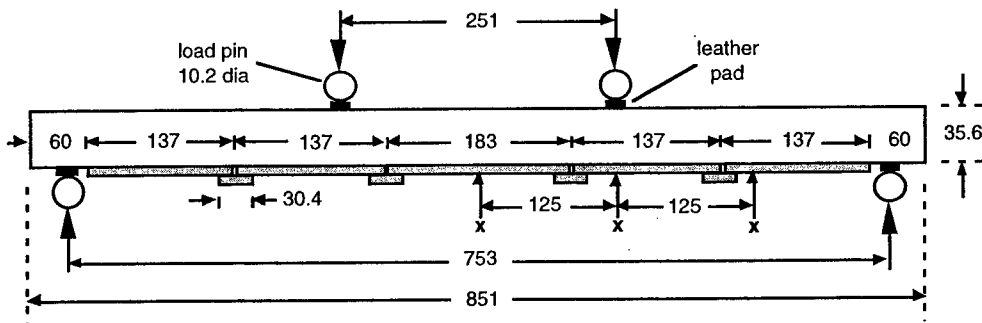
Experimental set-up for flexural testing of 8.5-m concrete beam with bonded composite plates (all dimensions in cm).
